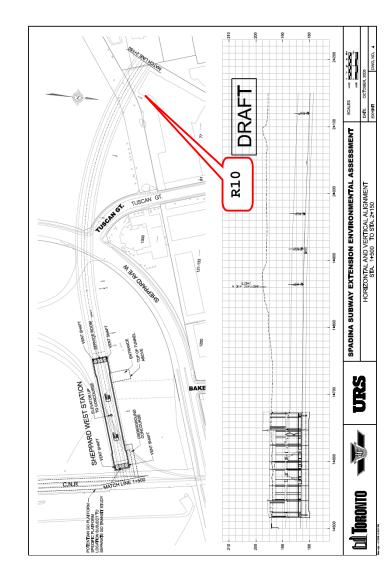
PLAN AND PROFILE OF THE PROPOSED SUBWAY ALIGNMENT
